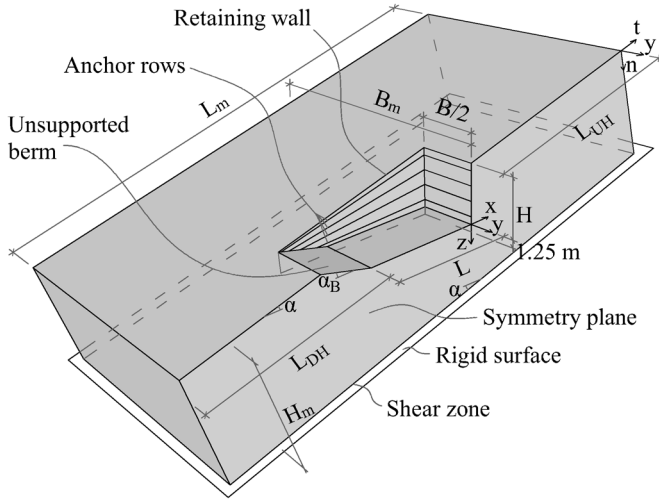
Geometry of the modelled landslide portion, the excavation pit, the retaining wall and the soil anchor rows.
